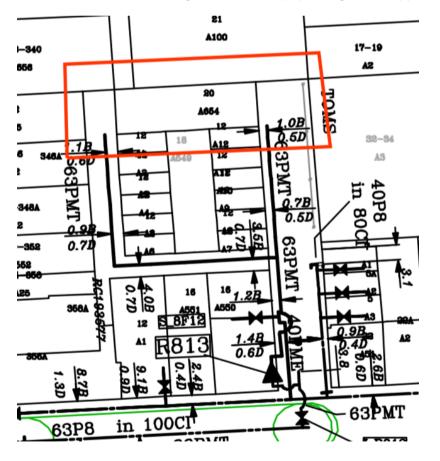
Existing APA Natural Gas Mains Located in Toms Court and adjoining Public Road.
